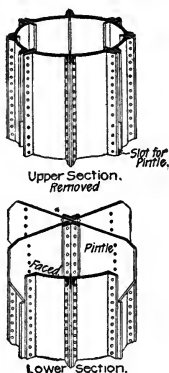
Detail of Phoenix Column Splice used in R. G. Dun Building, New York.
